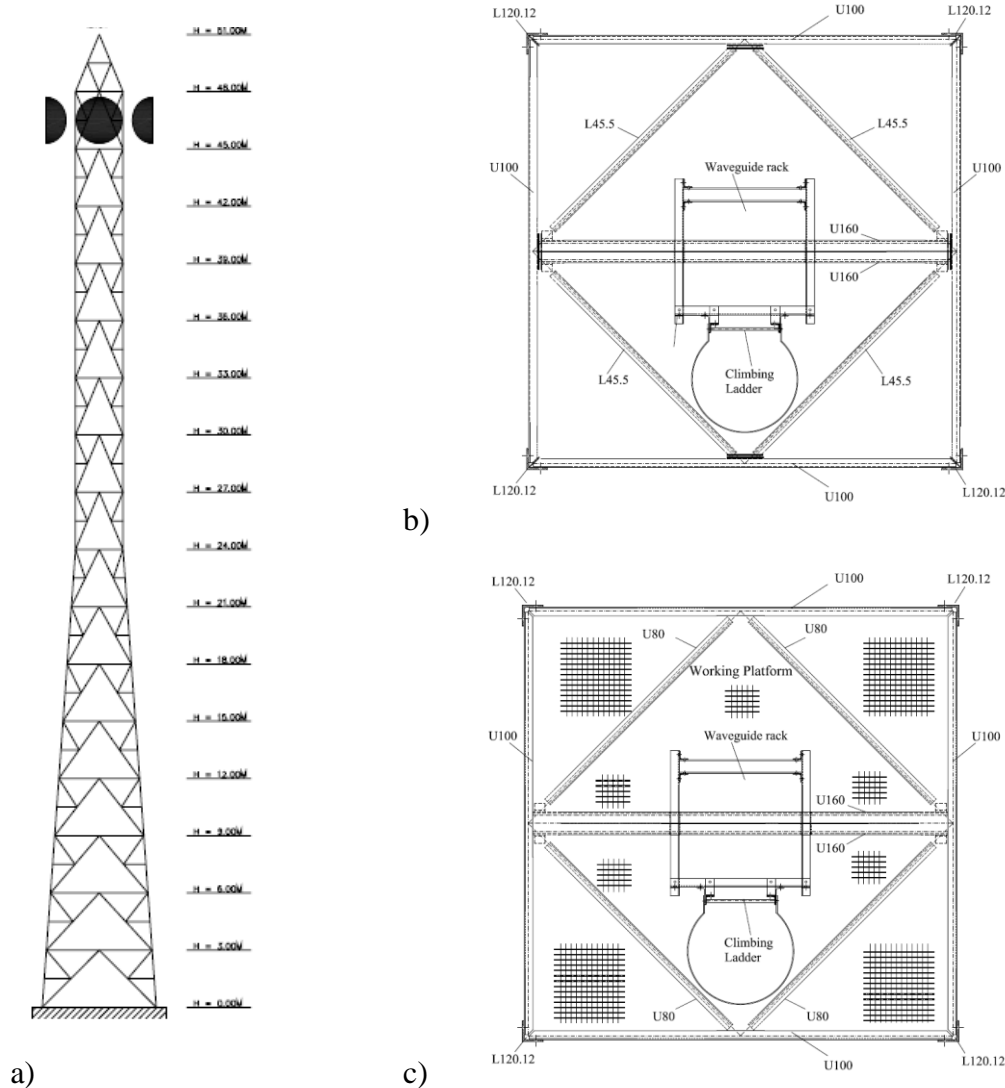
a) Complete view of the tower. b) Typical plan of a horizontal diaphragm. c) Typical plan of a working platform [9].
